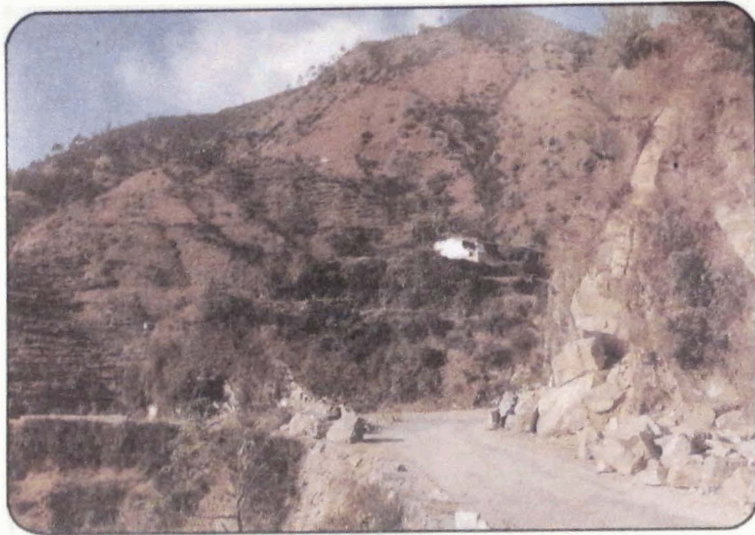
Dislodgement of rock blocks near Gorthi village. Partial collapse of the short wall of a village house in the background.
